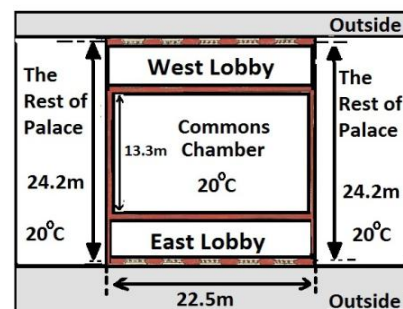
Schematic floor plan showing the location of the House of Commons Chamber. It has been adapted from [2].
